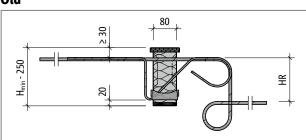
Schöck Isokorb® T type K-BH: Product section
